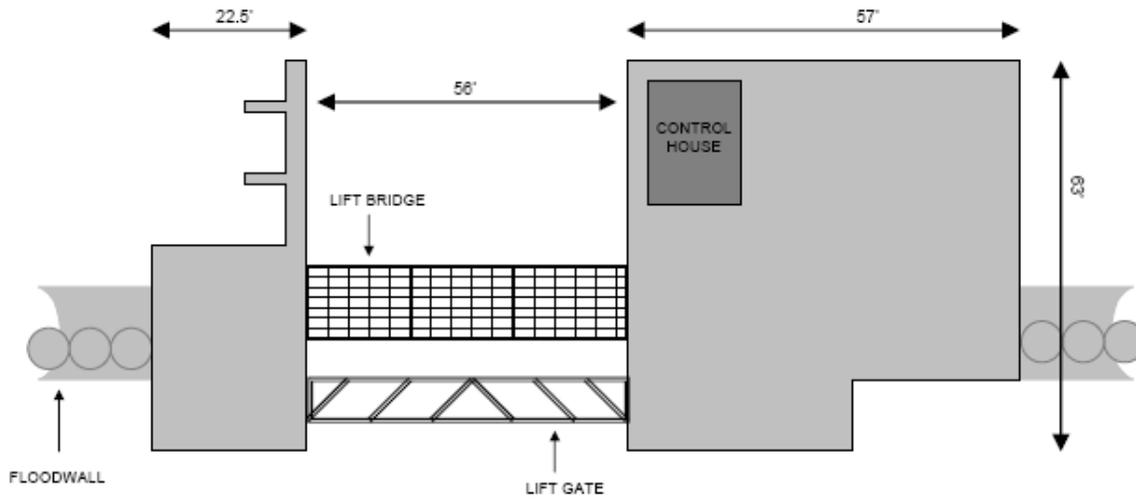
Bayou Bienvenue vertical lift gate and bridge complex in plan view
